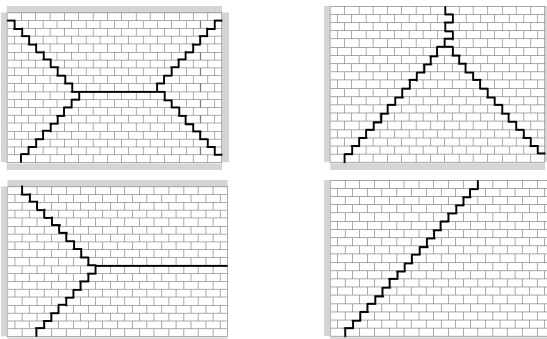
Failure mechanism of masonry walls with varied boundary conditions[11]
